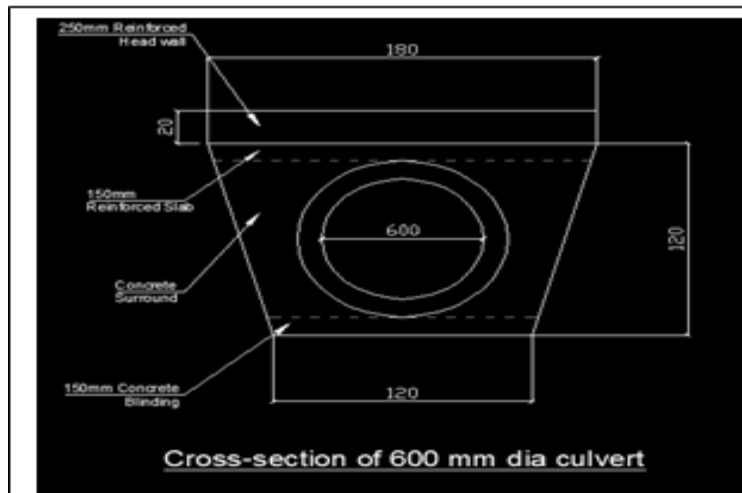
AUTOCAD Depiction of Cross Section of the Proposed Culvert in Kurutie Environs.
